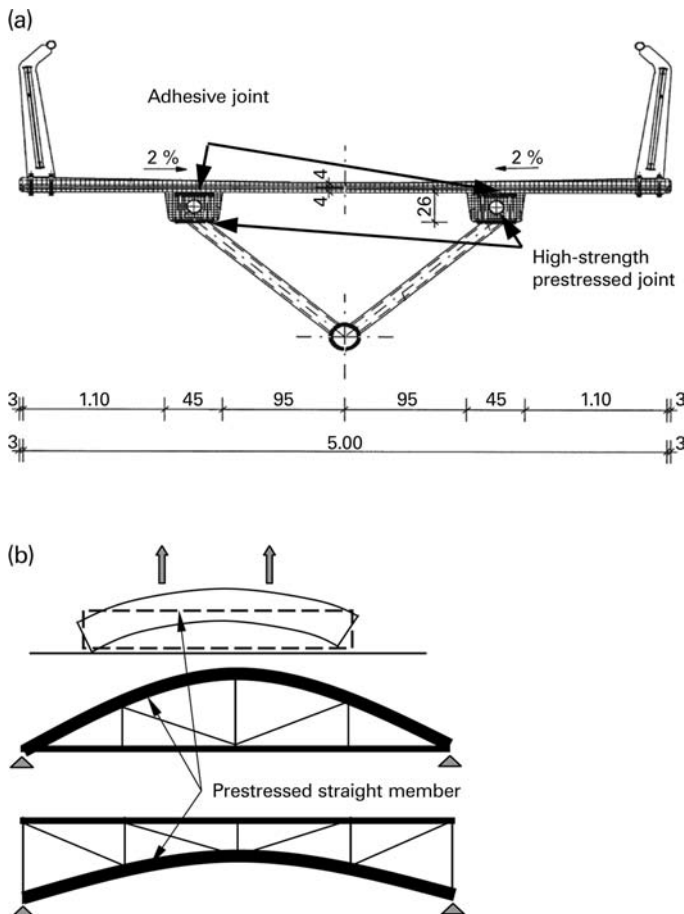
a) Section through Gärtnerplatz Bridge and b) bending the UHPC segments, which were originally cast straight (sketch of principle)
